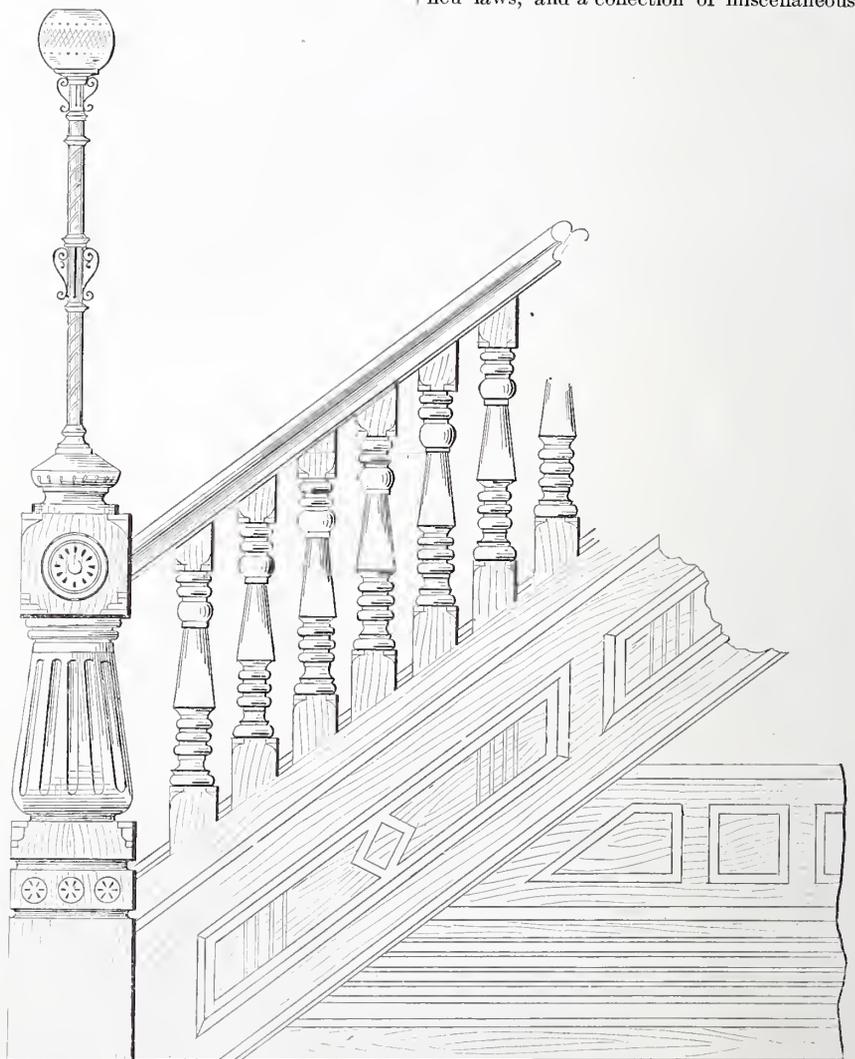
Main Stairs and Wainscot in Front Hall.—Scale, 3/4 Inch to the Foot.
